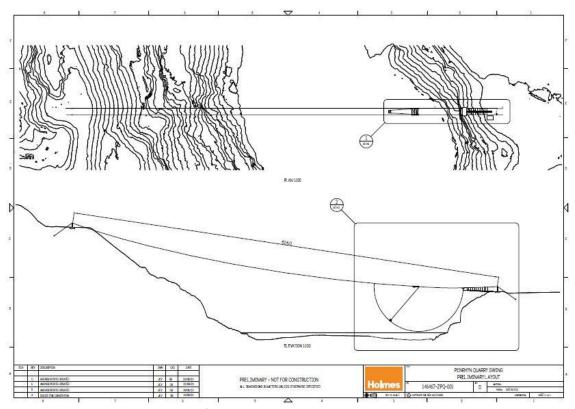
An elevation and plan of the proposed swing, provided by the developers.
